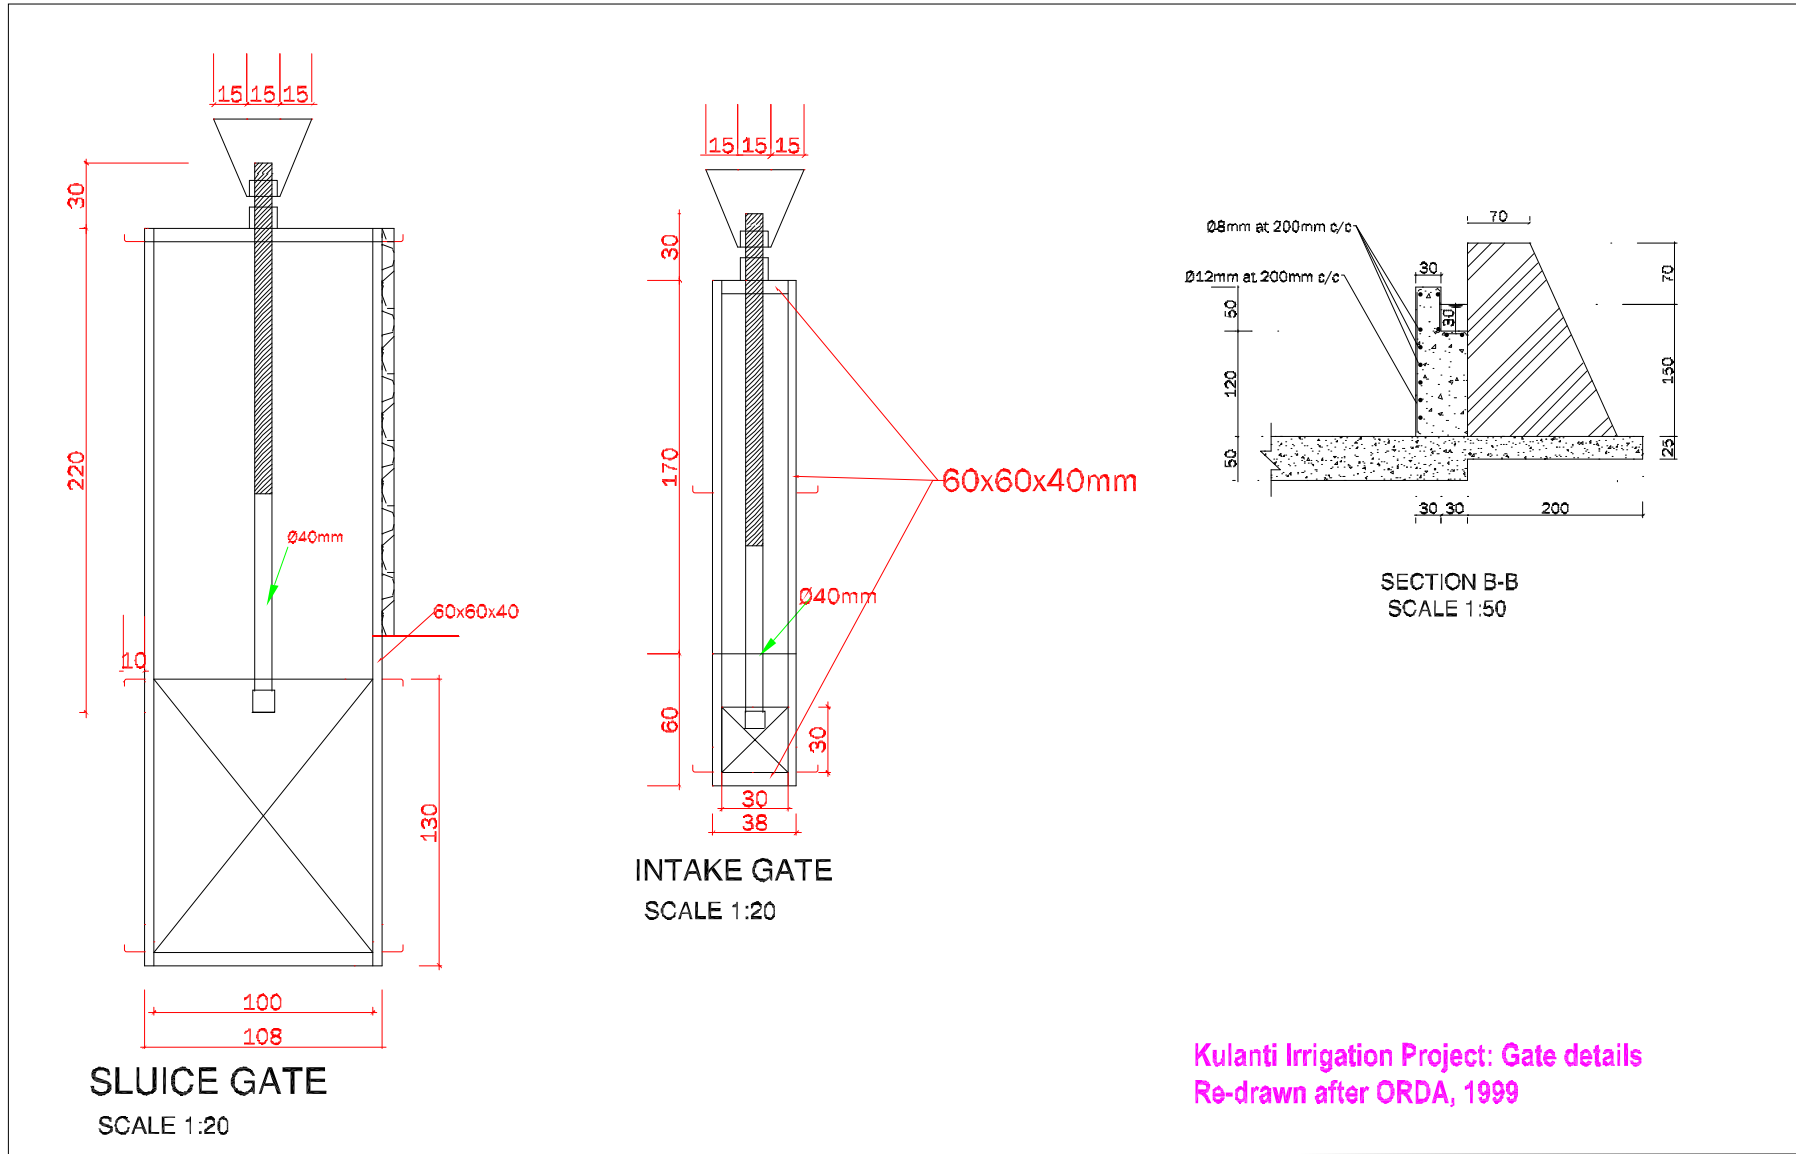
Plan, Section and Gate details for Kulanti diversion weir
